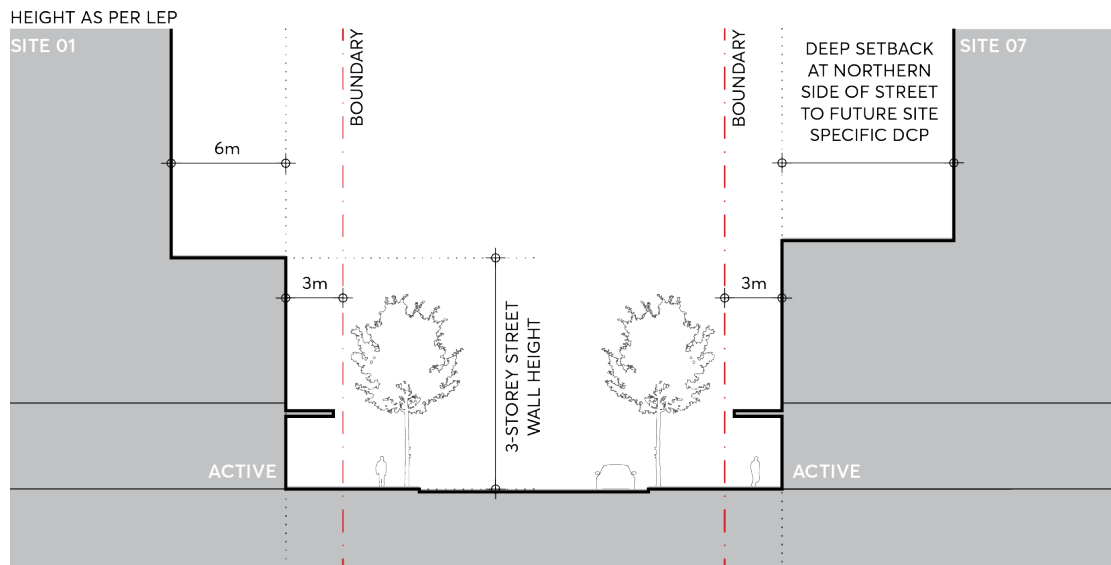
Marion Street (Section B) Setbacks and Street Wall Height
